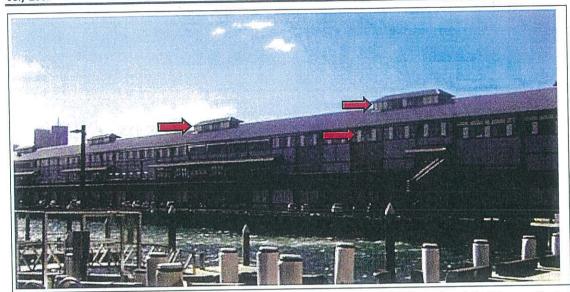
Infill panels around windows and four hip roof skylight, Throughout Building – Fibrecement sheeting
